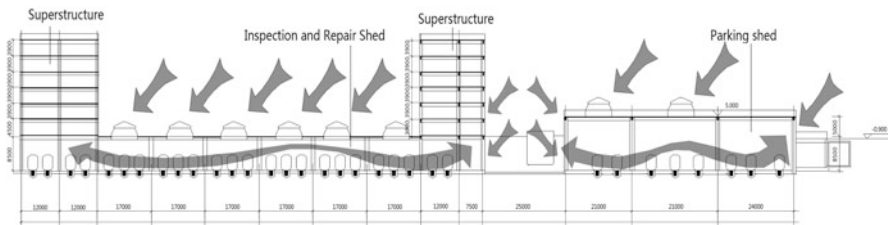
The diagram of top and side lighting ventilation of underground depot of Beijing Coking Plant (Source: Beijing Urban Construction Institute)
